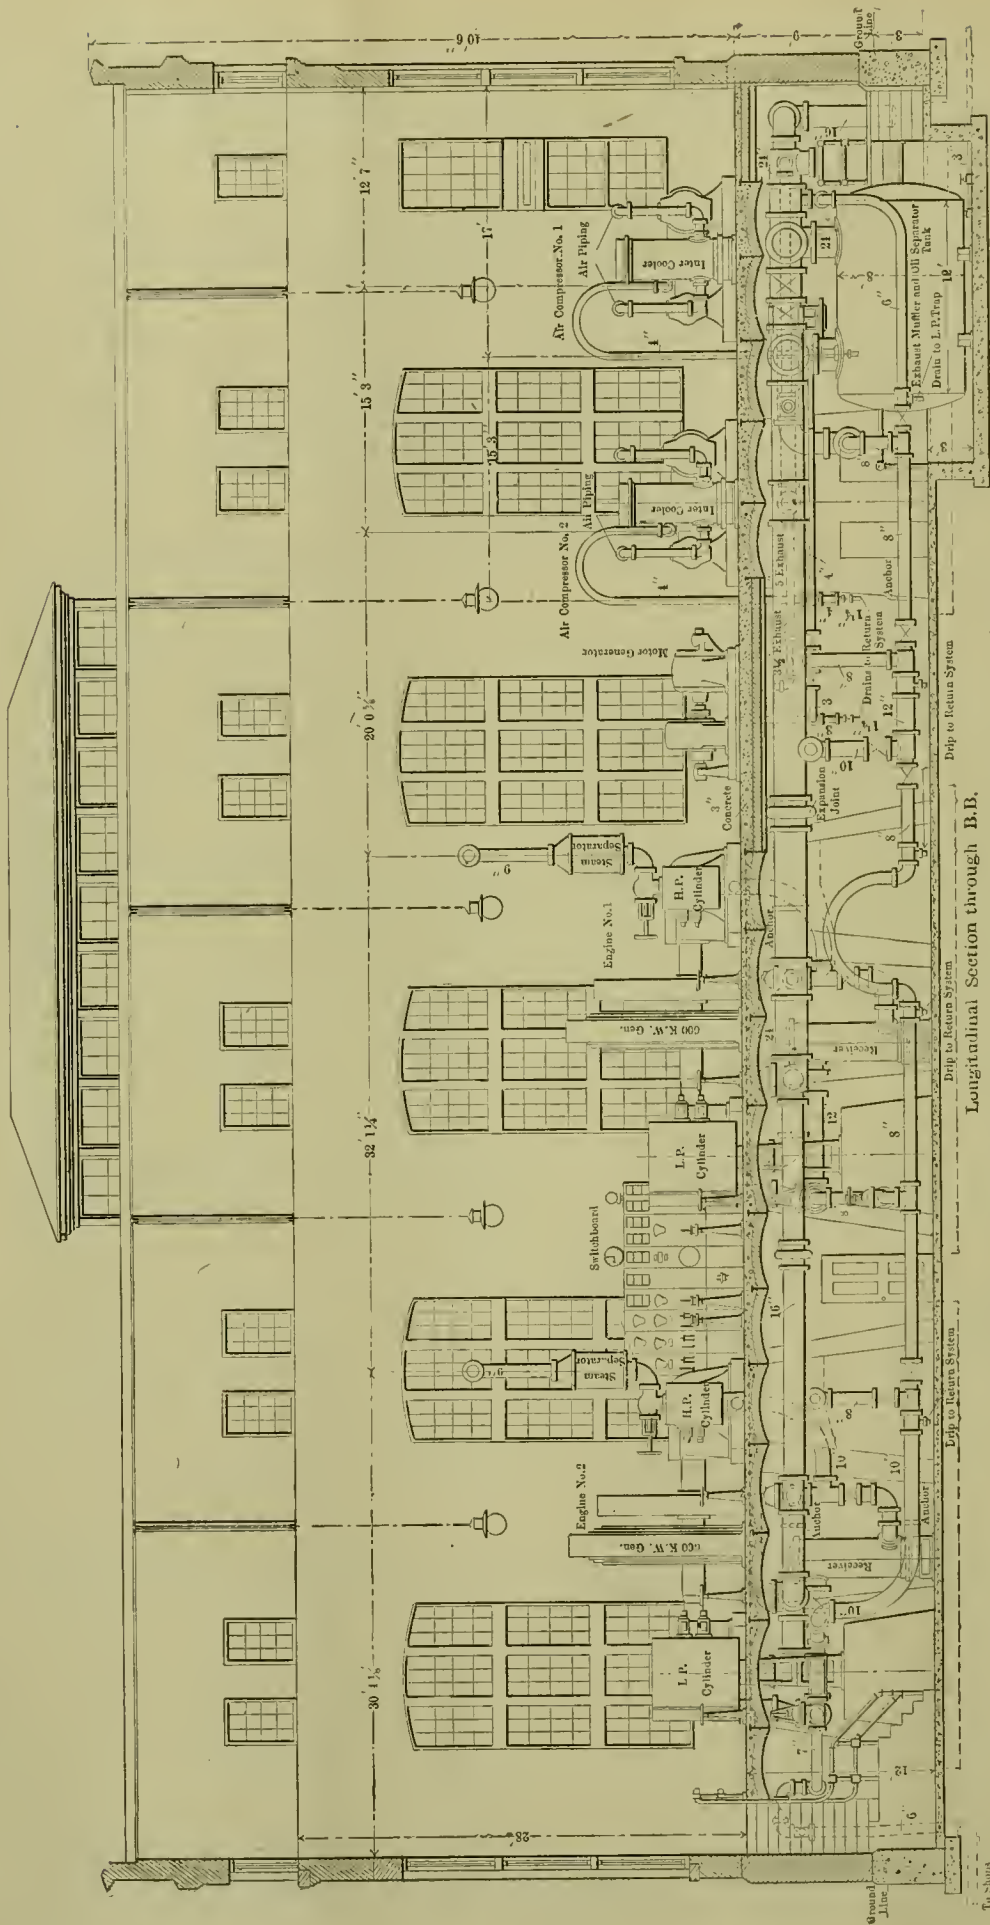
SECTION THROUGH BOILERS AND MAIN ENGINES.
